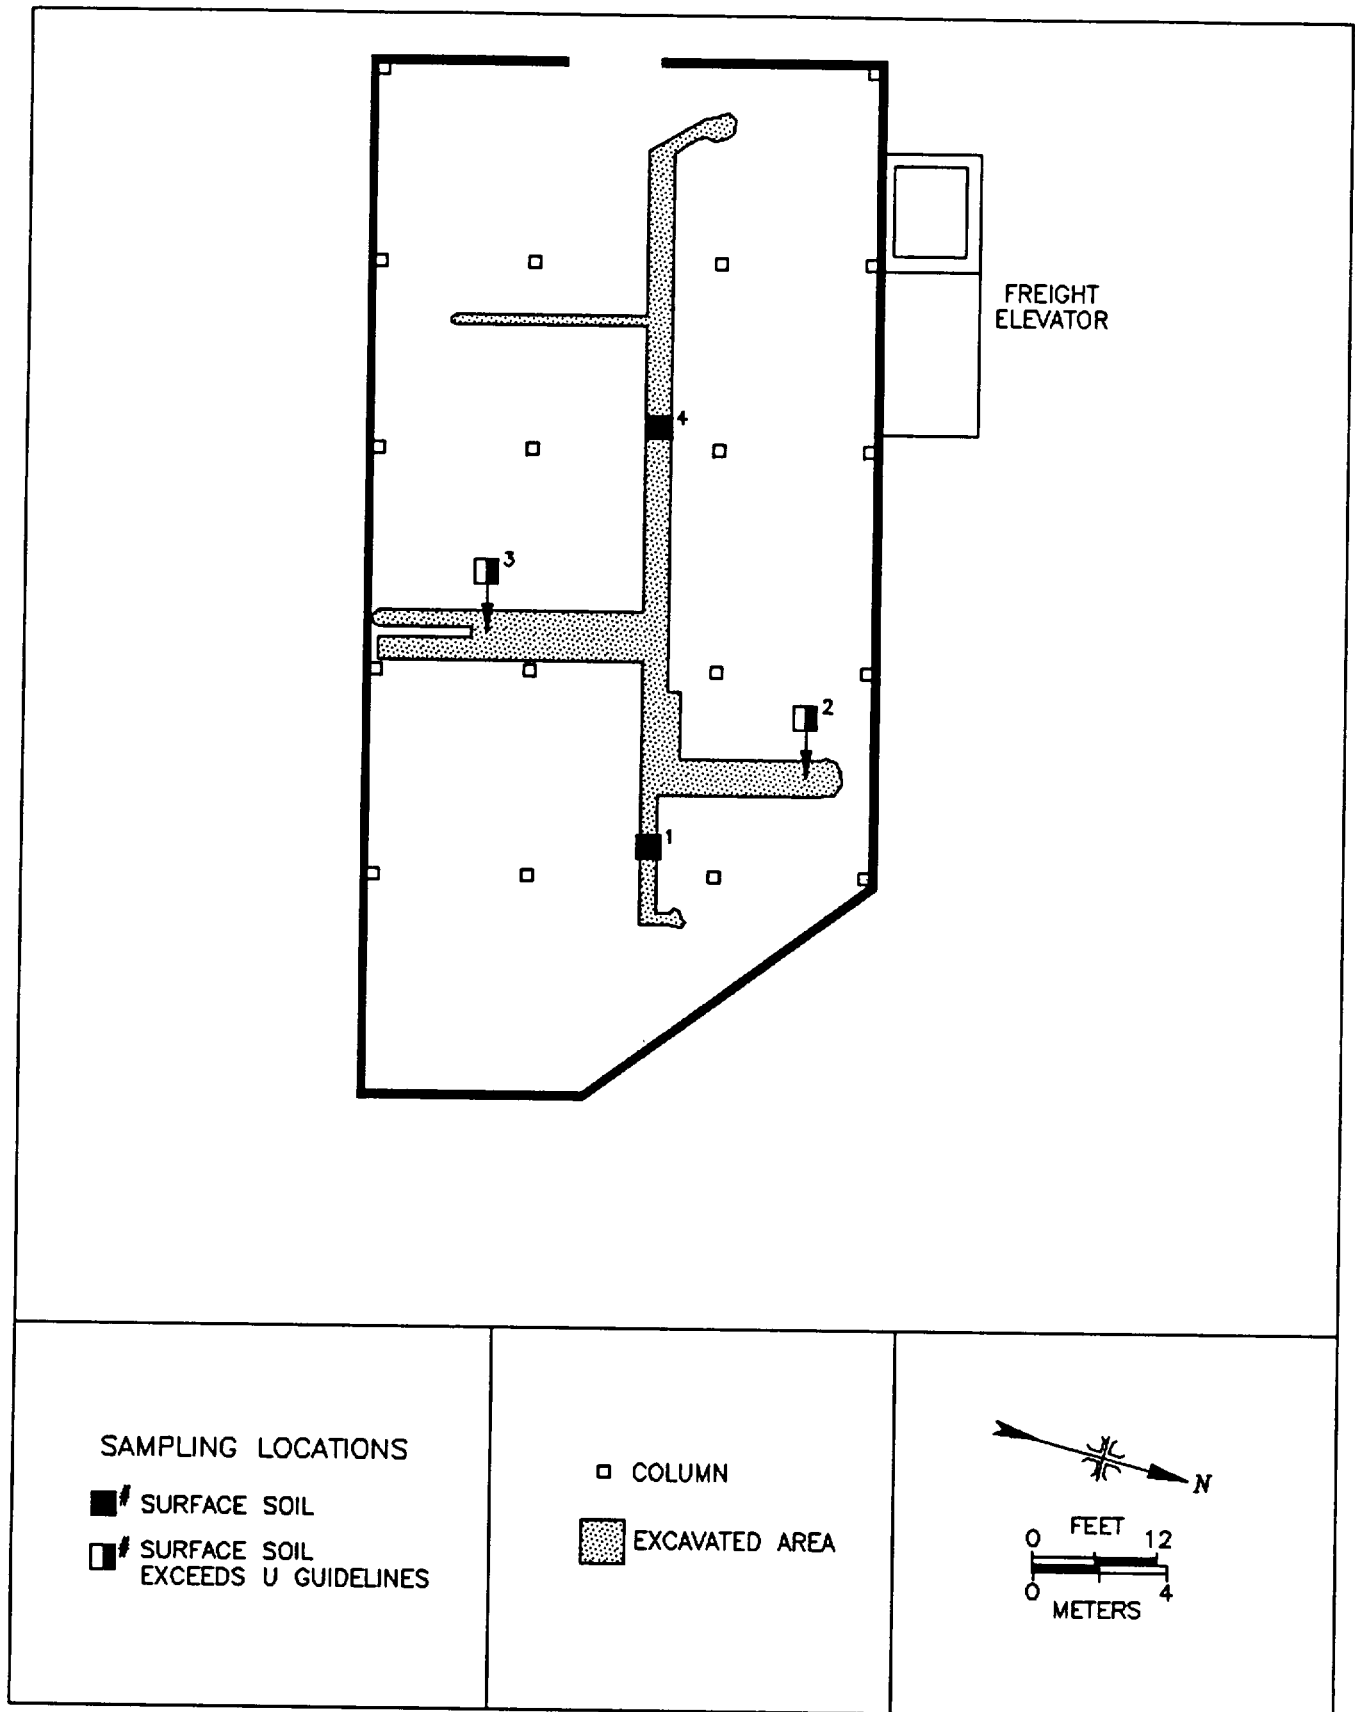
Building 7, Basement – Soil Sampling Locations
